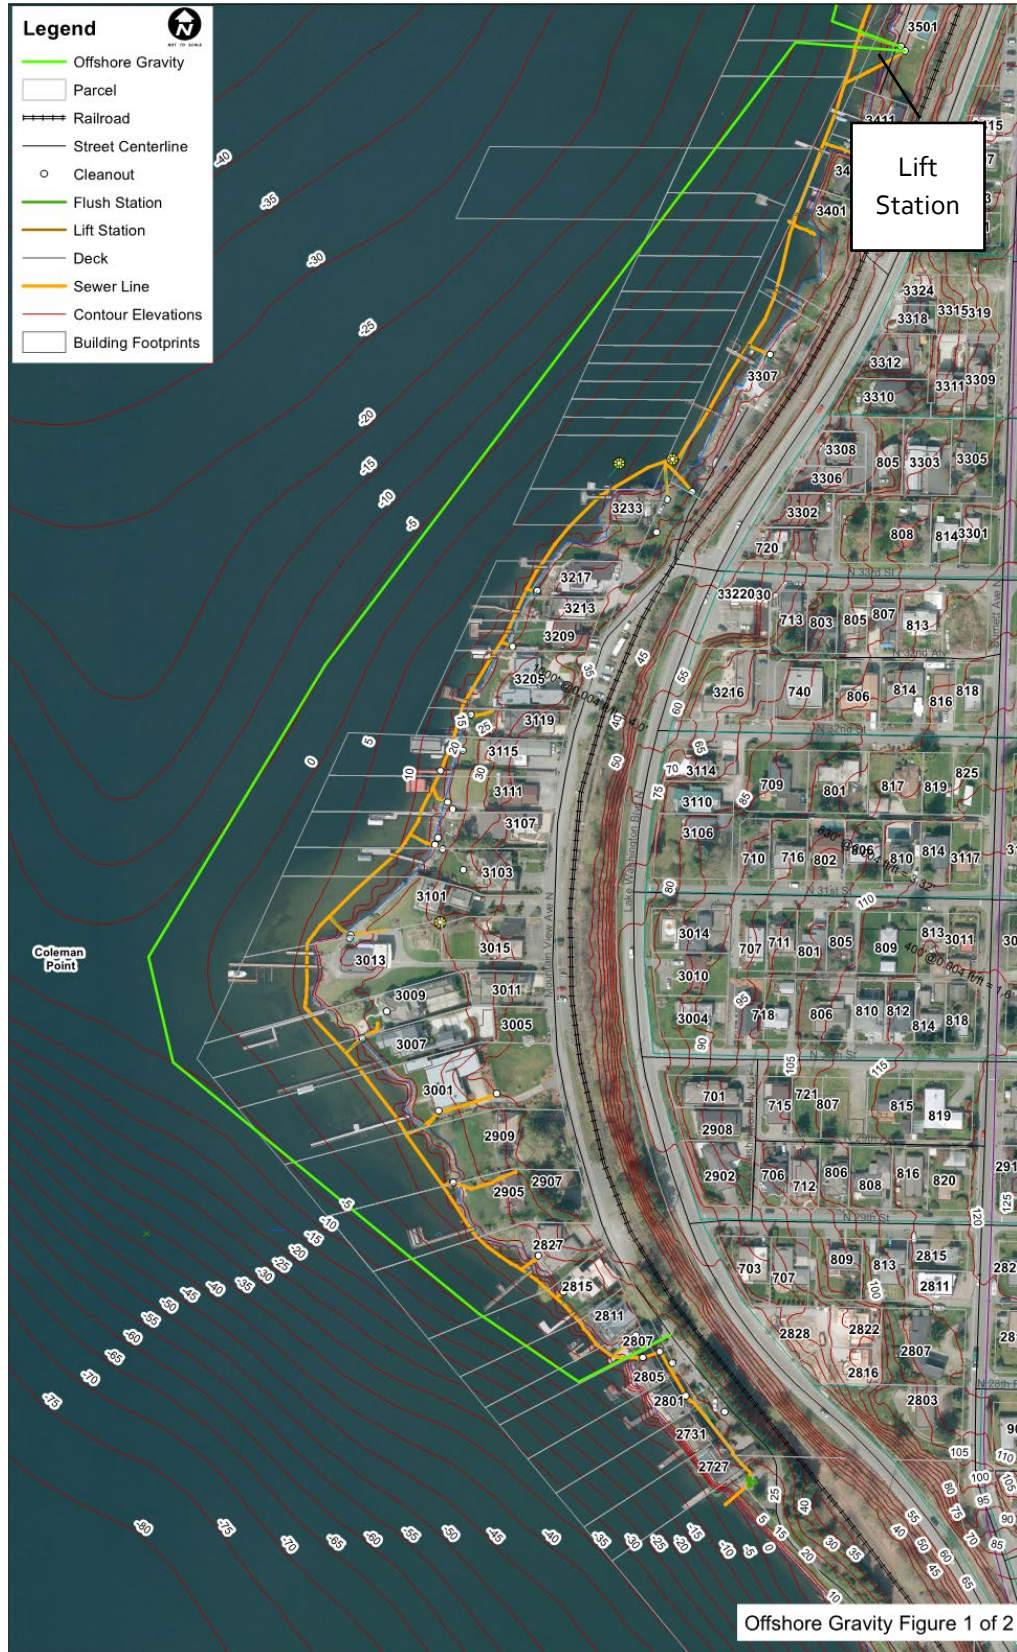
Southern Conceptual Lake Line Gravity Sewer Alignment Offshore in Lake Washington
